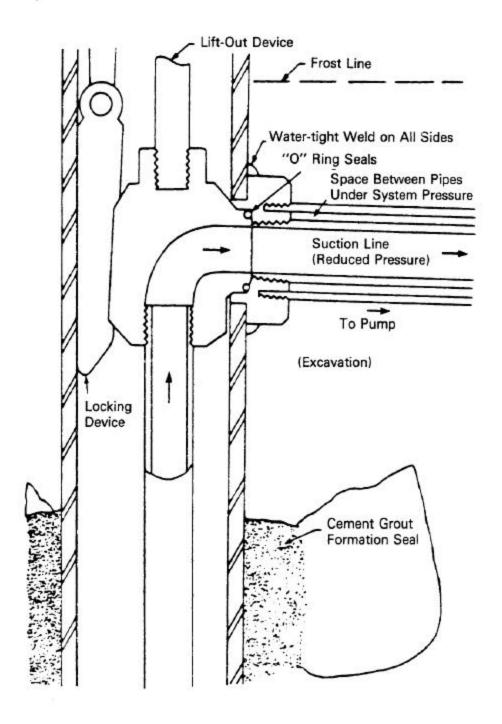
Weld-on Pit-less Adapter with Concentric External Piping for "Shallow Well" Pump Installation
